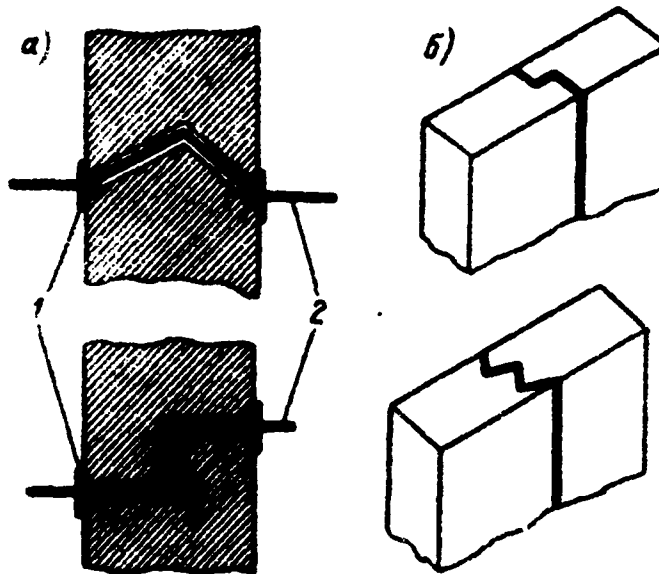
Diagram of cable or pipe channels in radiation shielding and shielding plate joints: a -- sketch of cable channel in radiometric shielding; b -- sketch of slitless plate joining for radiation shielding; 1 -- packing; 2 -- pipe or cable.
